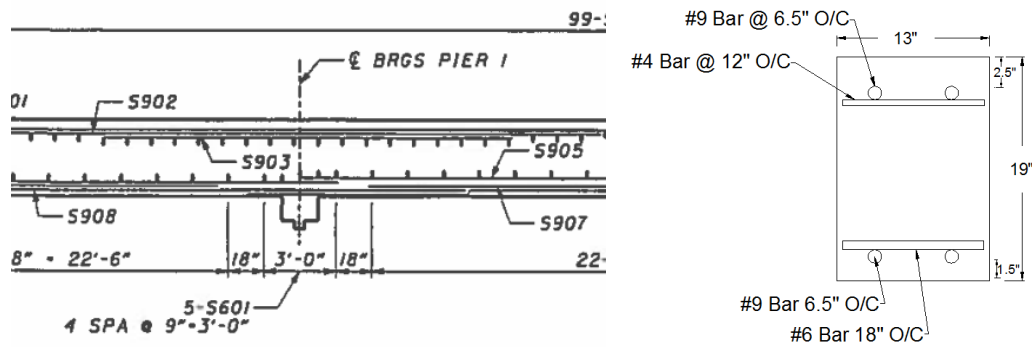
Slab Section Representing the Negative Moment Region of Bridge (left) and Typical Cross Sections Details of the Test Specimen (Right)
